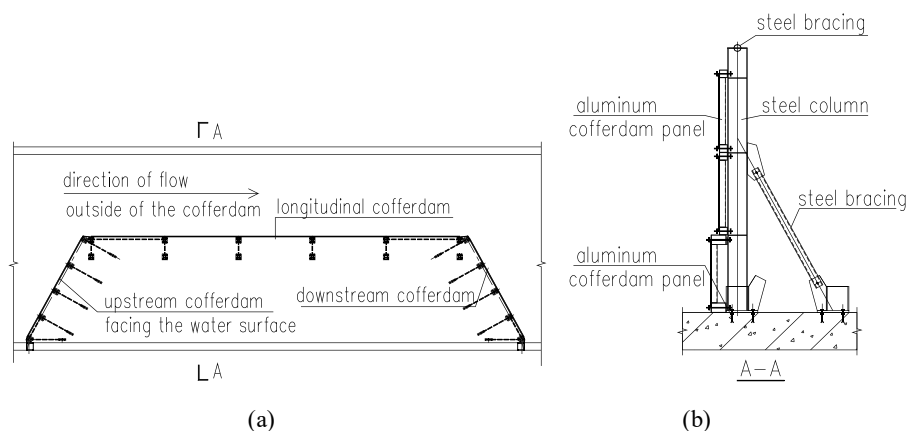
Main Body of the Rapidly Transferable, Assembled Tunnel Inspection Cofferdam Device.
